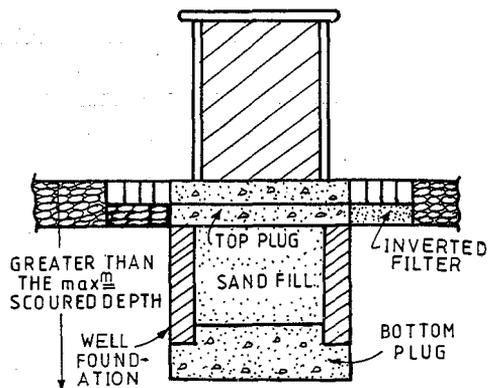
(b) Cross-section of Divide Wall beyond Pucca floor.
